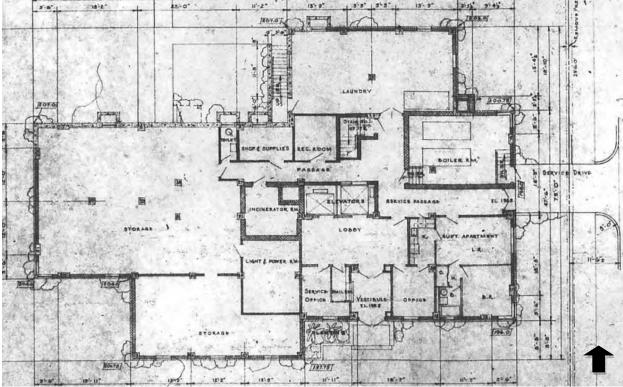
Historic site plan. J.F. Lauck, *Quality Hill Towers*, arch. drawings, sheet 4M, 1950.
